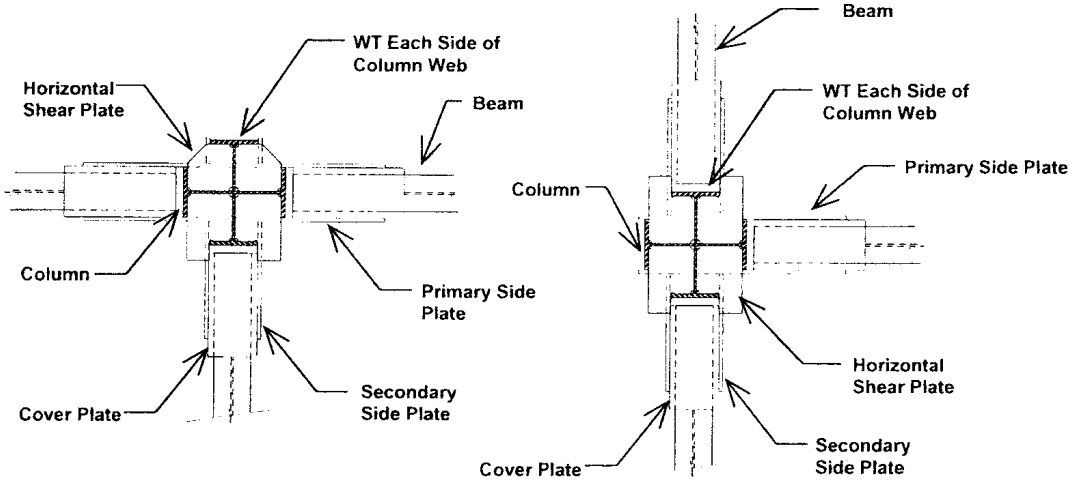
SIDEPLATE® BASIC UNIAXIAL CONFIGURATION
